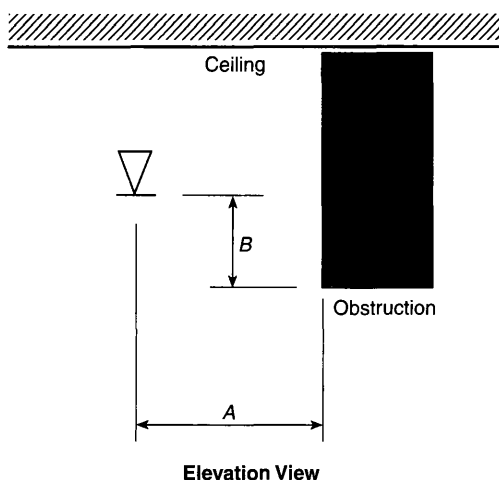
(a) Positioning of Sprinklers to Avoid Obstructions to Discharge (SSU/SSP).
